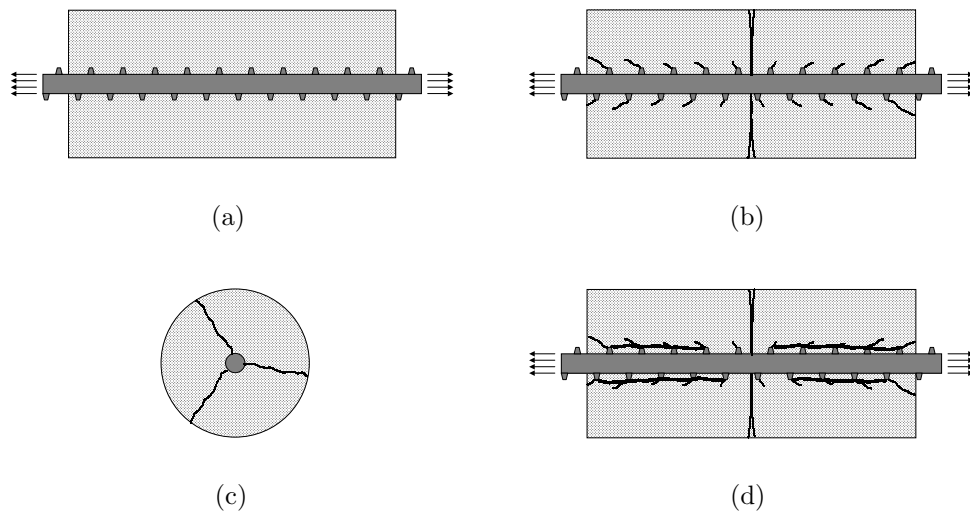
Pull-out of reinforcement in concrete. Elastic stage (a), followed by primary (plane-vertical) and secondary (conical transverse) cracking (b). Finally, either a splitting of the concrete embedment(c) or a crushing of the concrete in front of the ribs of the reinforcing bar (d) may take place. Inspired by Noghabai (1995).
